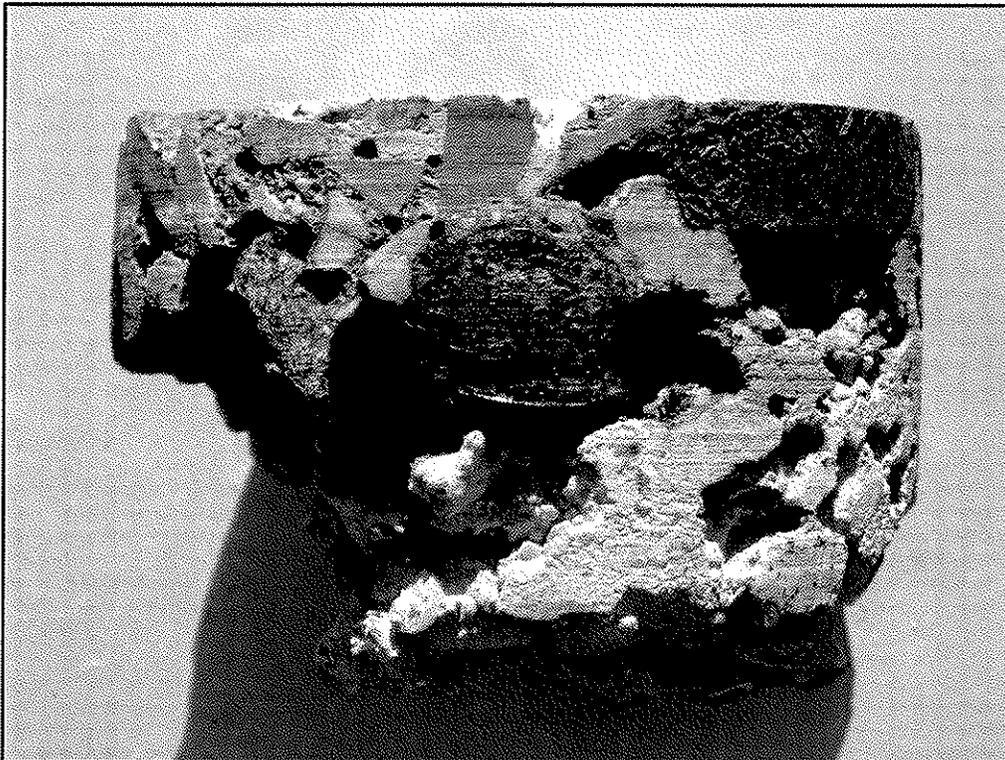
Poor consolidation of concrete observed around reinforcing steel bars.
